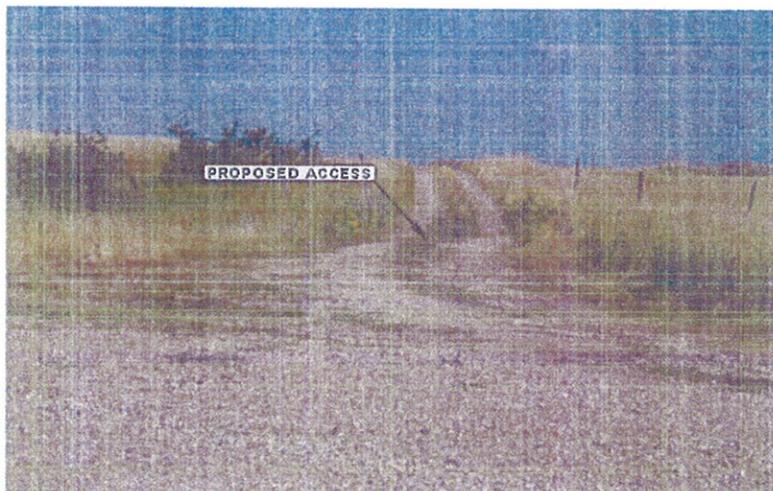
PHOTO: VIEW FROM BIA 13 TO BEGINNING OF PROPOSED ACCESS
